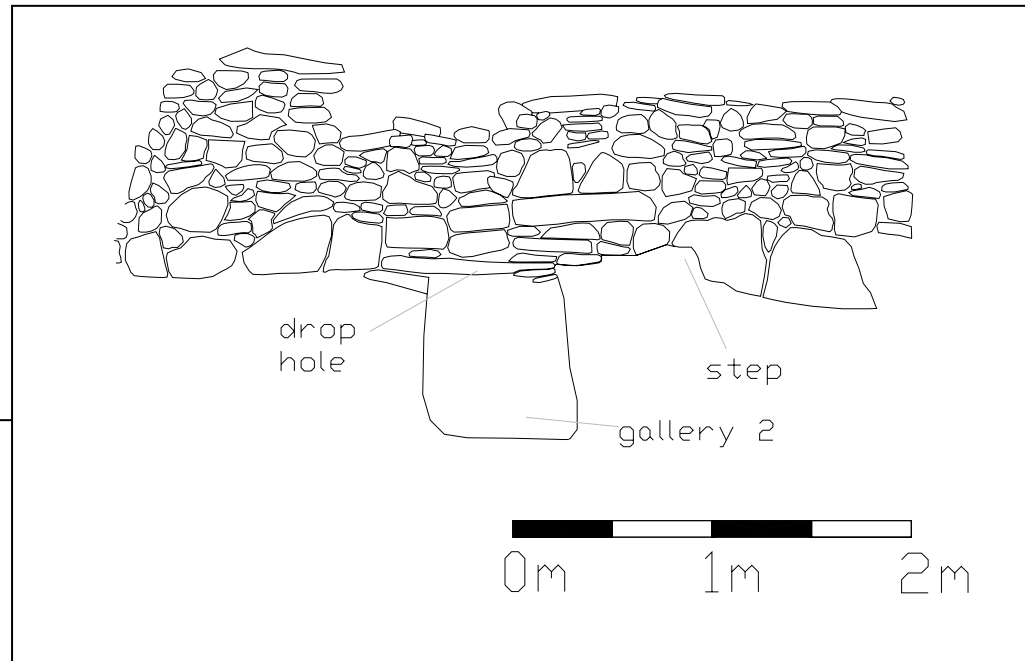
Wall D, north wall of gallery 1, with step and drop hole detail (Grid Point solutions with additions)
